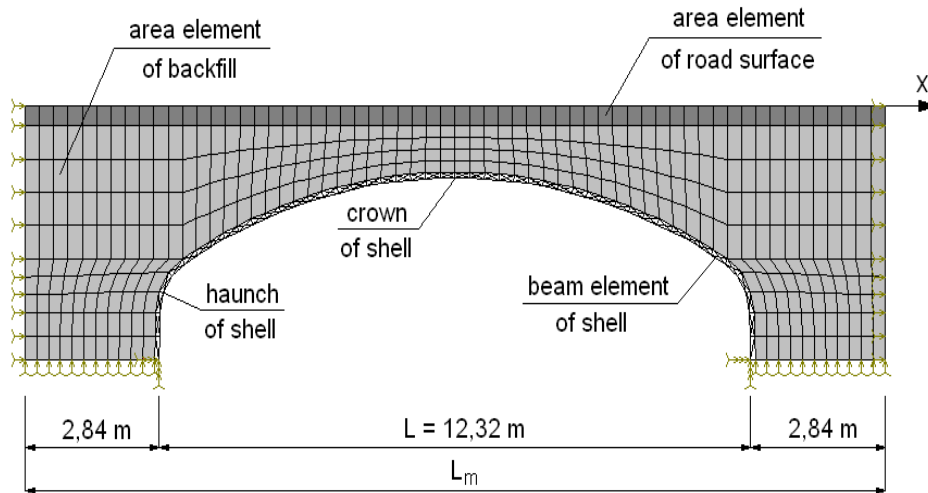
Longitudinal section of the soil-steel bridge in Szczytna.
